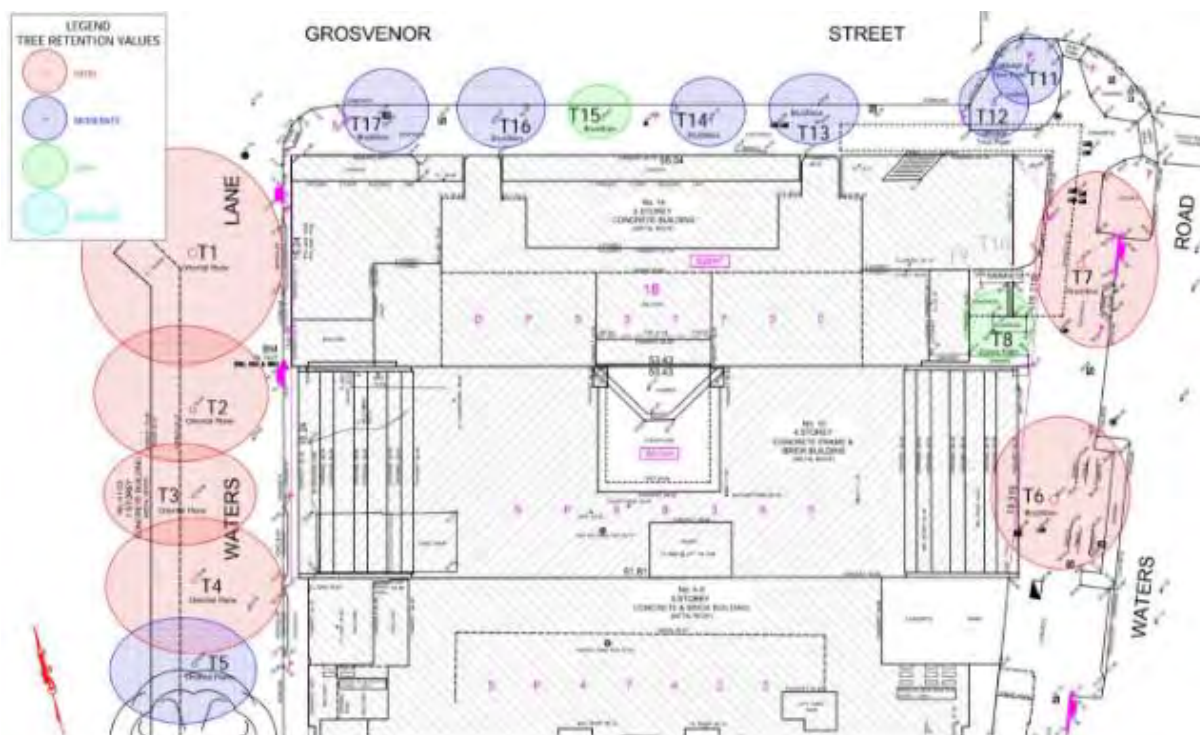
Extract from Tree Location Plan – (Source: Tree Impact Assessment Report)
